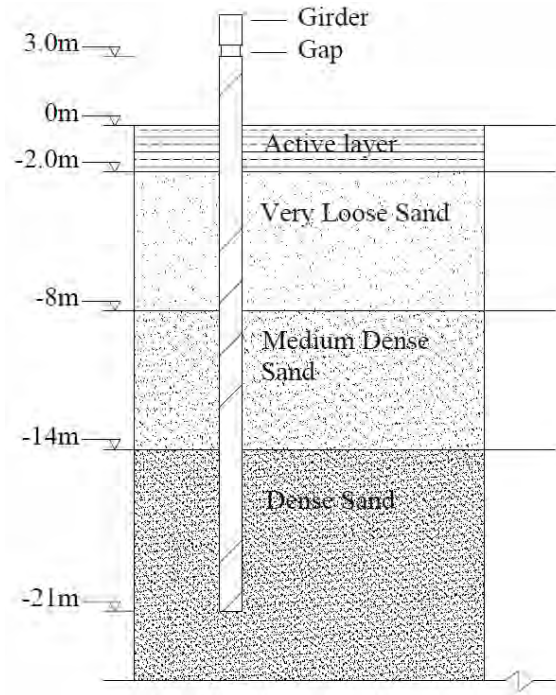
The soil-pile system of a typical bridge foundation system used in Alaska
